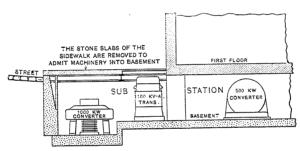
SECTIONAL ELEVATION, BASEMENT TYPE
